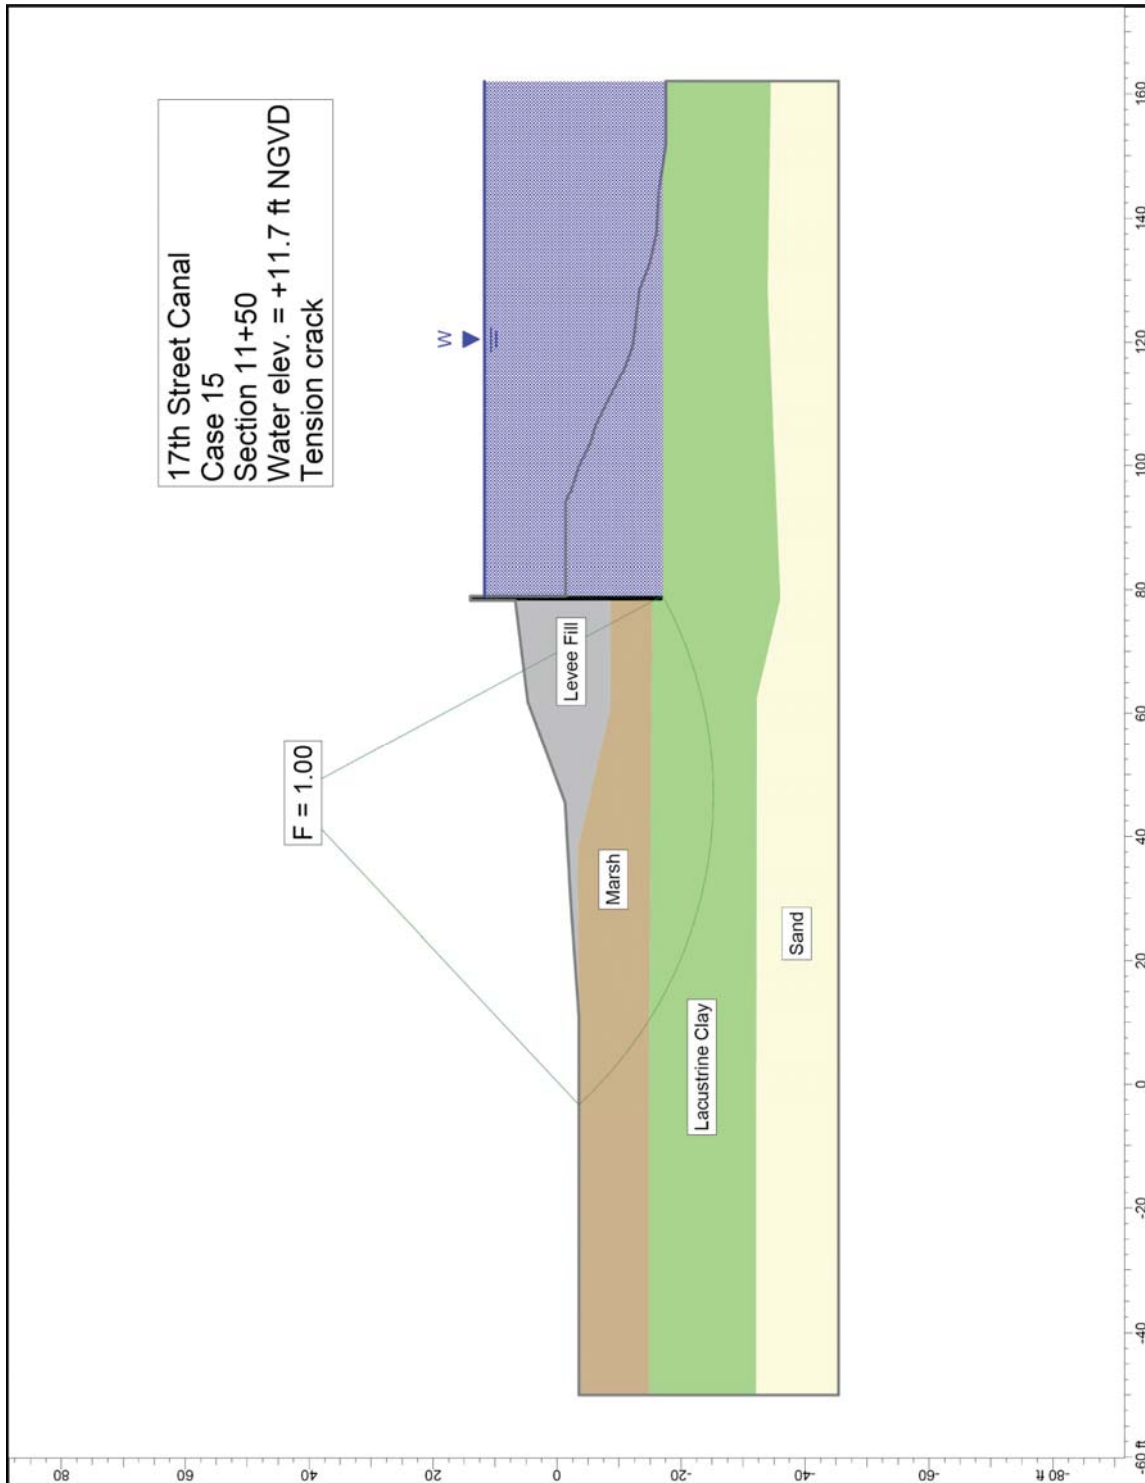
Critical circle for 17th Street Canal Station 11+50 – water elevation 11.7 ft, tension crack.
